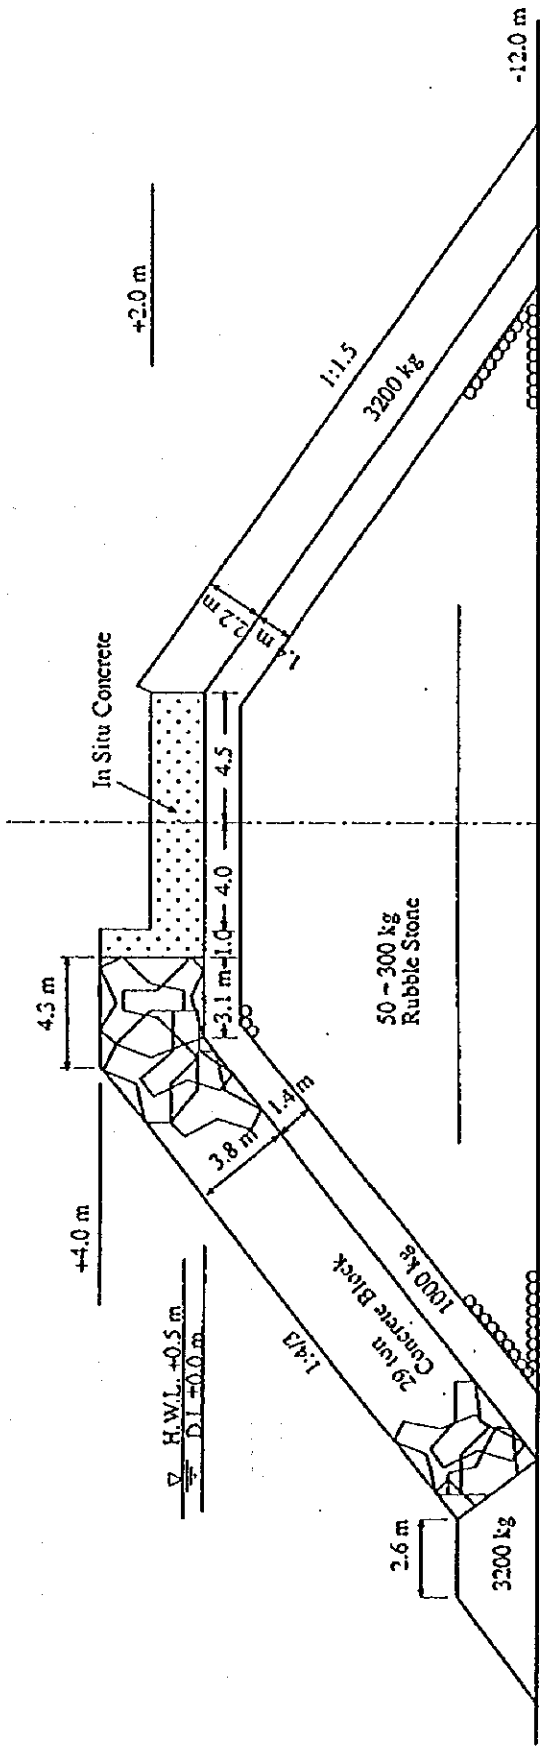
Standard Cross Section of Breakwater (-12.0m)
